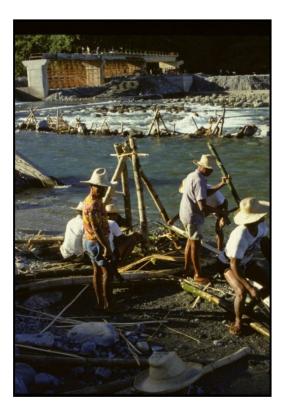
Zanjera San Marcelino farmers re-building bamboo, stone and brush dam (INIP Madongan Dam under construction in background). Source: Photo taken by Ruth Yabes, 1985.
